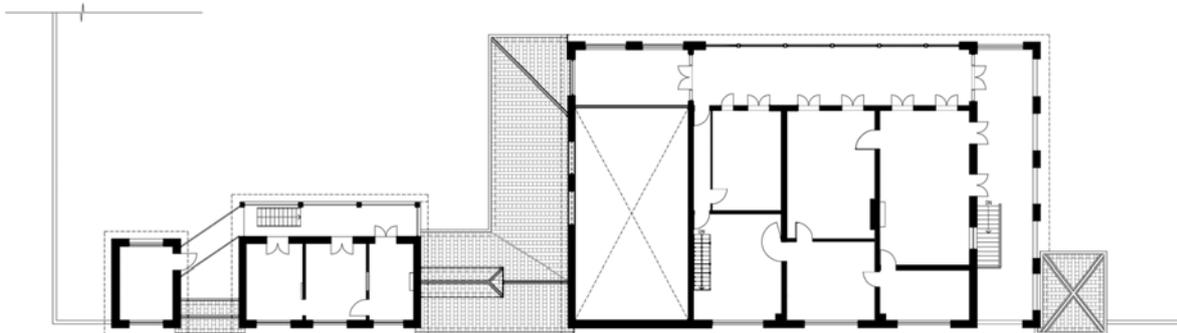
Possible first floor plan of the former clubhouse at No. 12 Oil Street in 1908.
